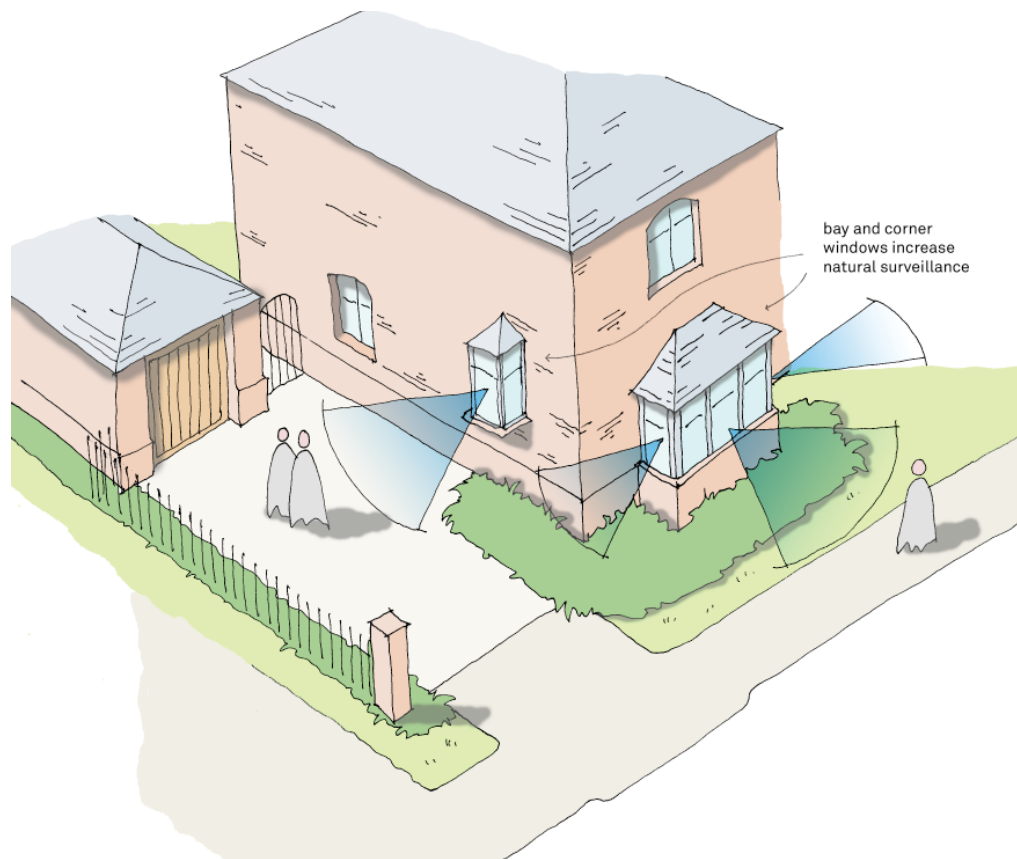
Corner rooms should have windows in walls addressing both sides of the street to allow complete surveillance and avoid problems of blank flank walls
